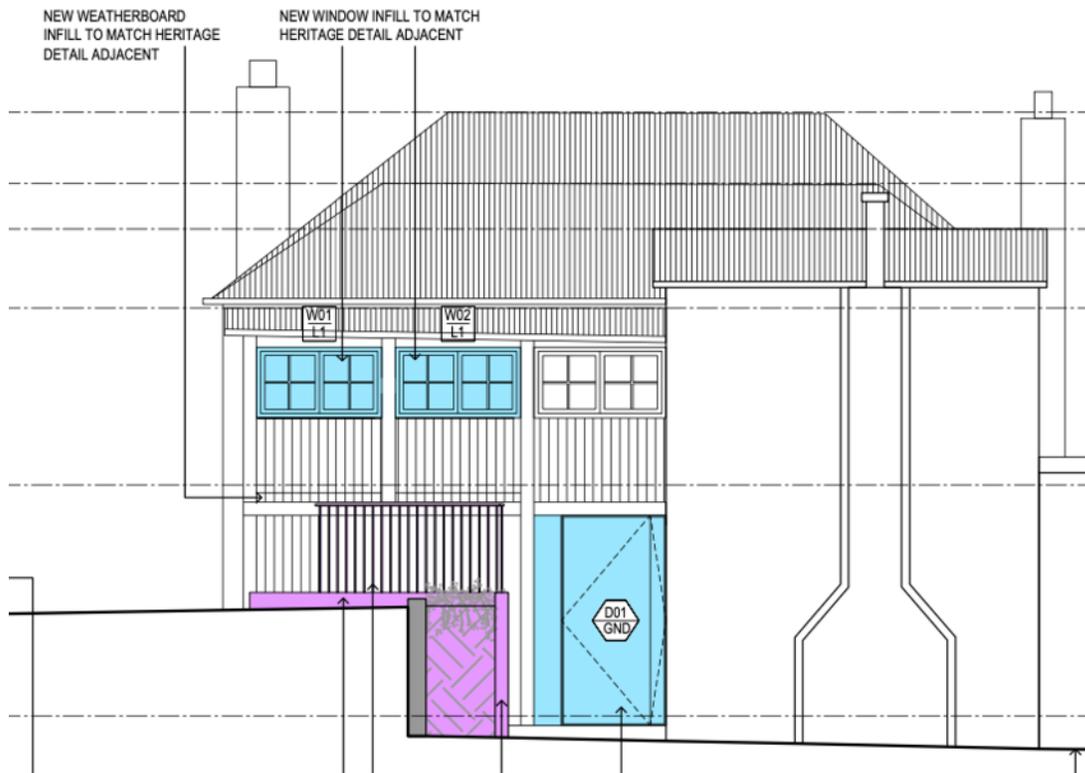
, Proposed northern elevation alterations for lift access, Michael Cumming Architect, 24.02.23
